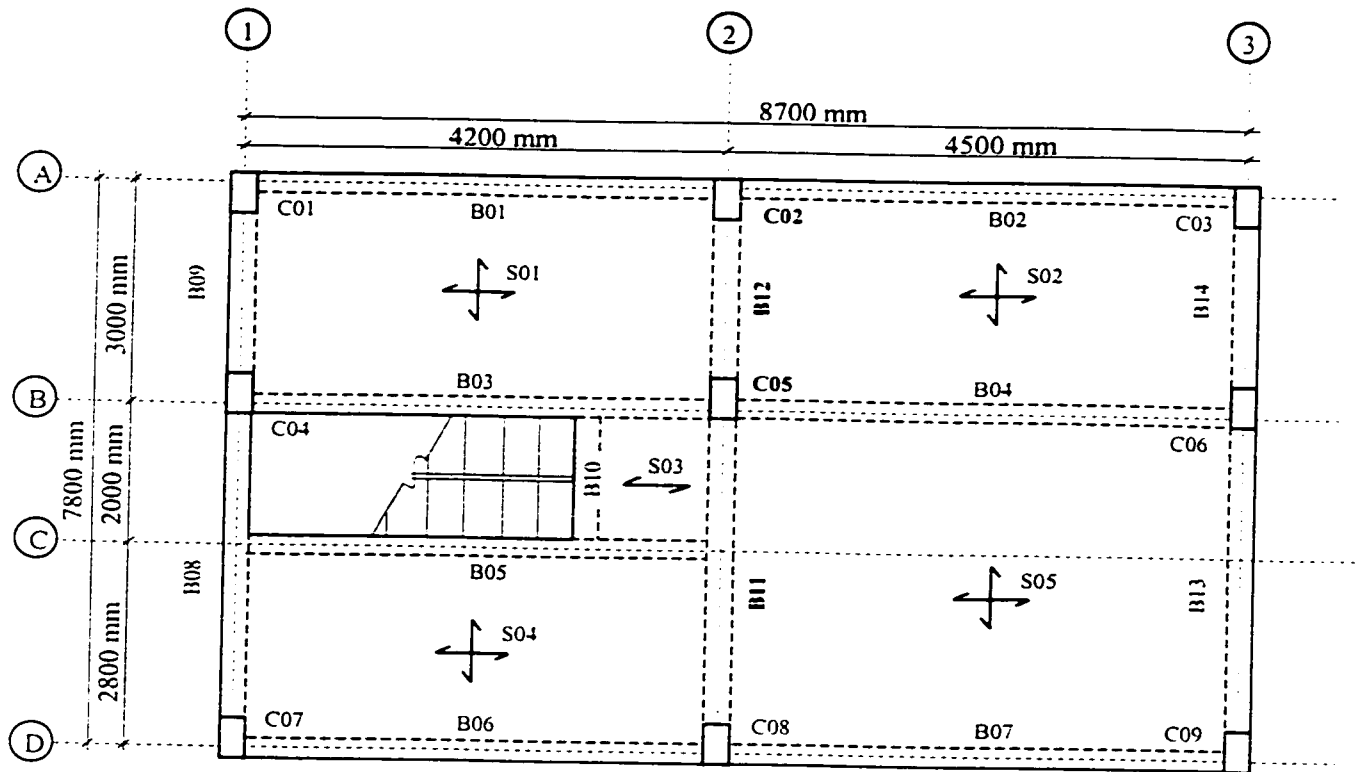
Structural First Floor Plan for the Concrete Building Example.
